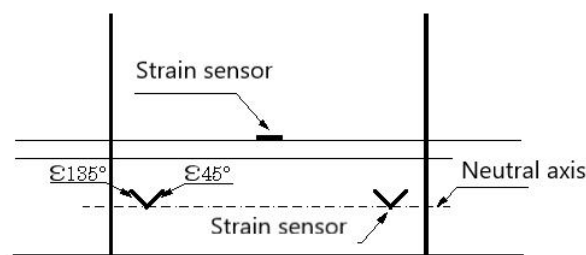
Schematic diagram of monitoring arrangement of girder strain
